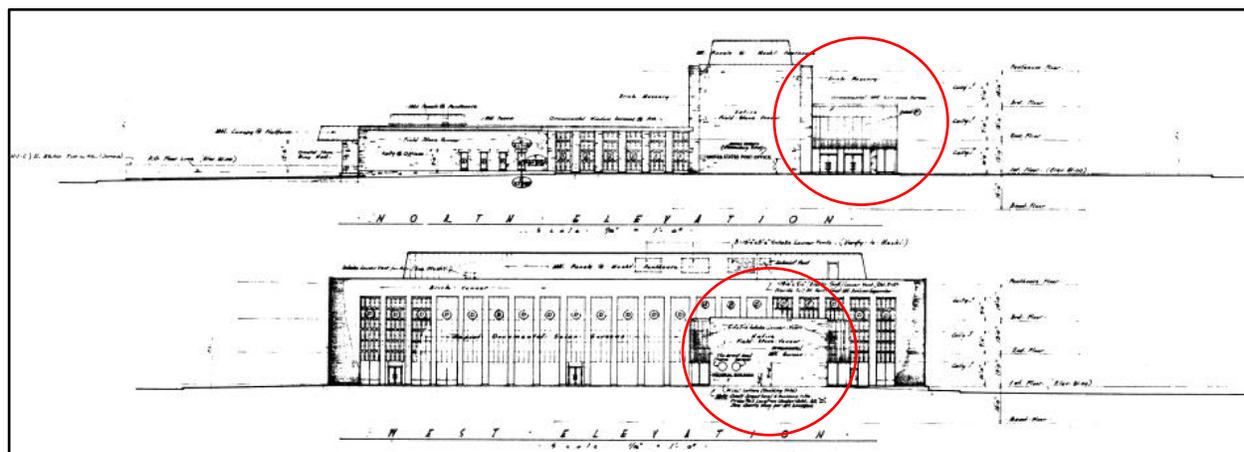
North and west elevations of Federal Building with proposed courthouse wing circled in red.⁴⁰
